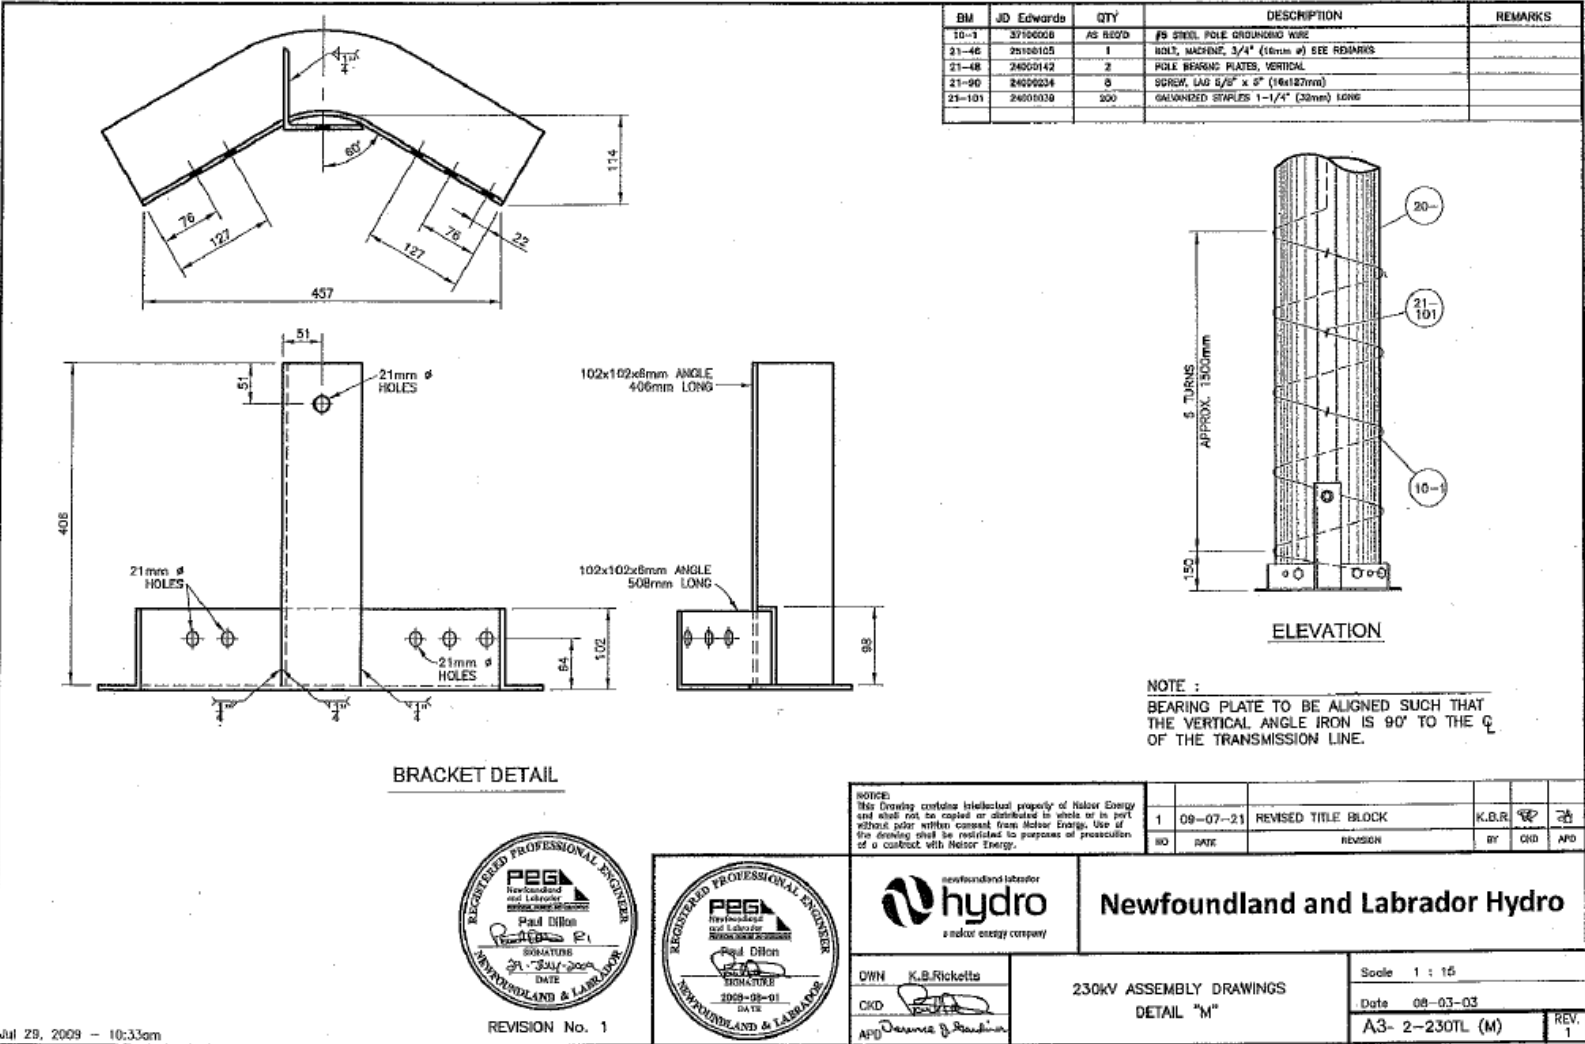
TL218 Wood Pole Foundation and Grounding
